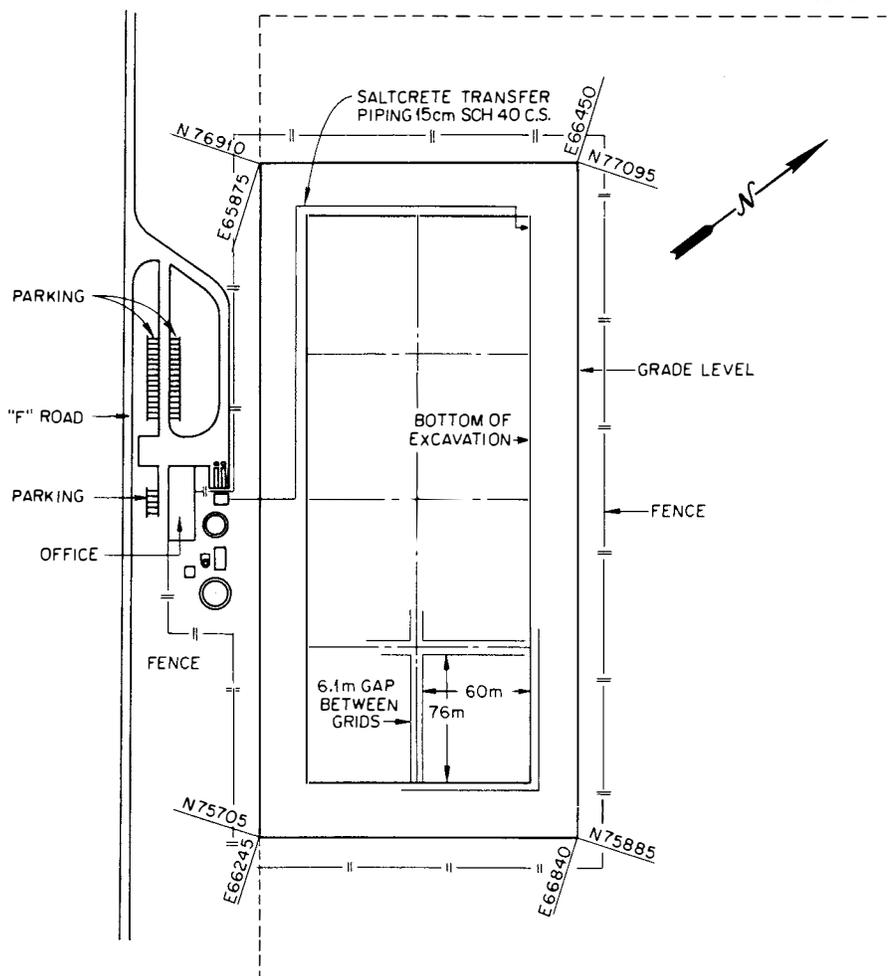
Plot plan of the 200-Z area for saltcrete burial. Source: EID, Sect. 3.
